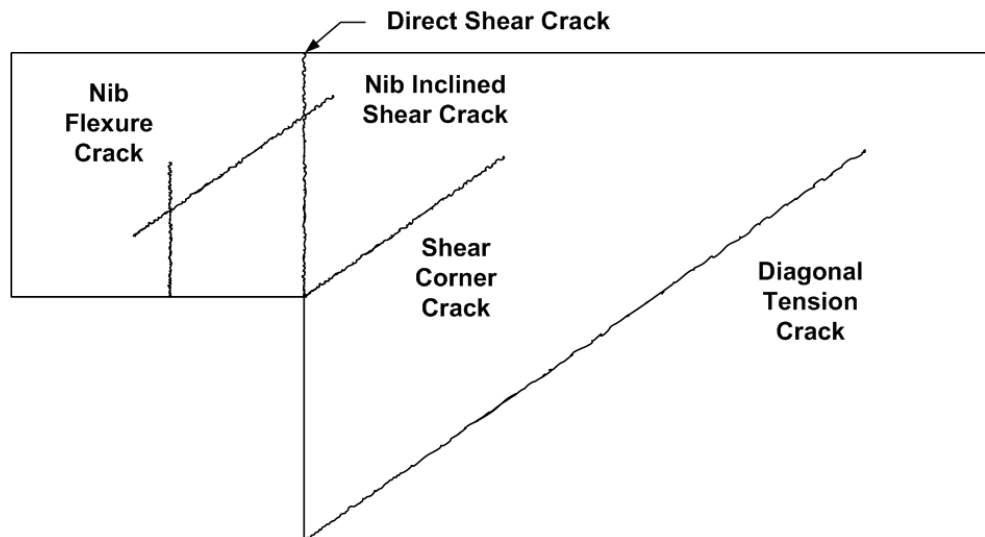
Crack Locations for Dapped End Double Tee Beams
